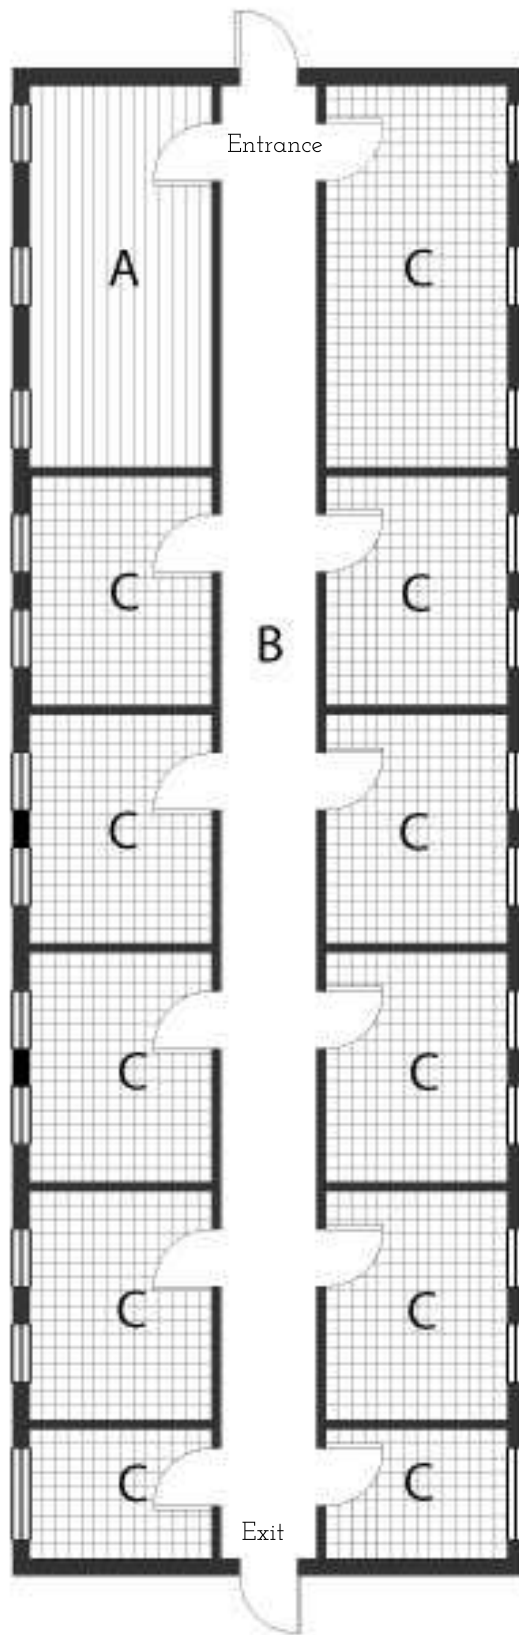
Floor Plan, Rabia Balkhi School, Kabul, Afghanistan. [Diagram by Mesut Sallah].
